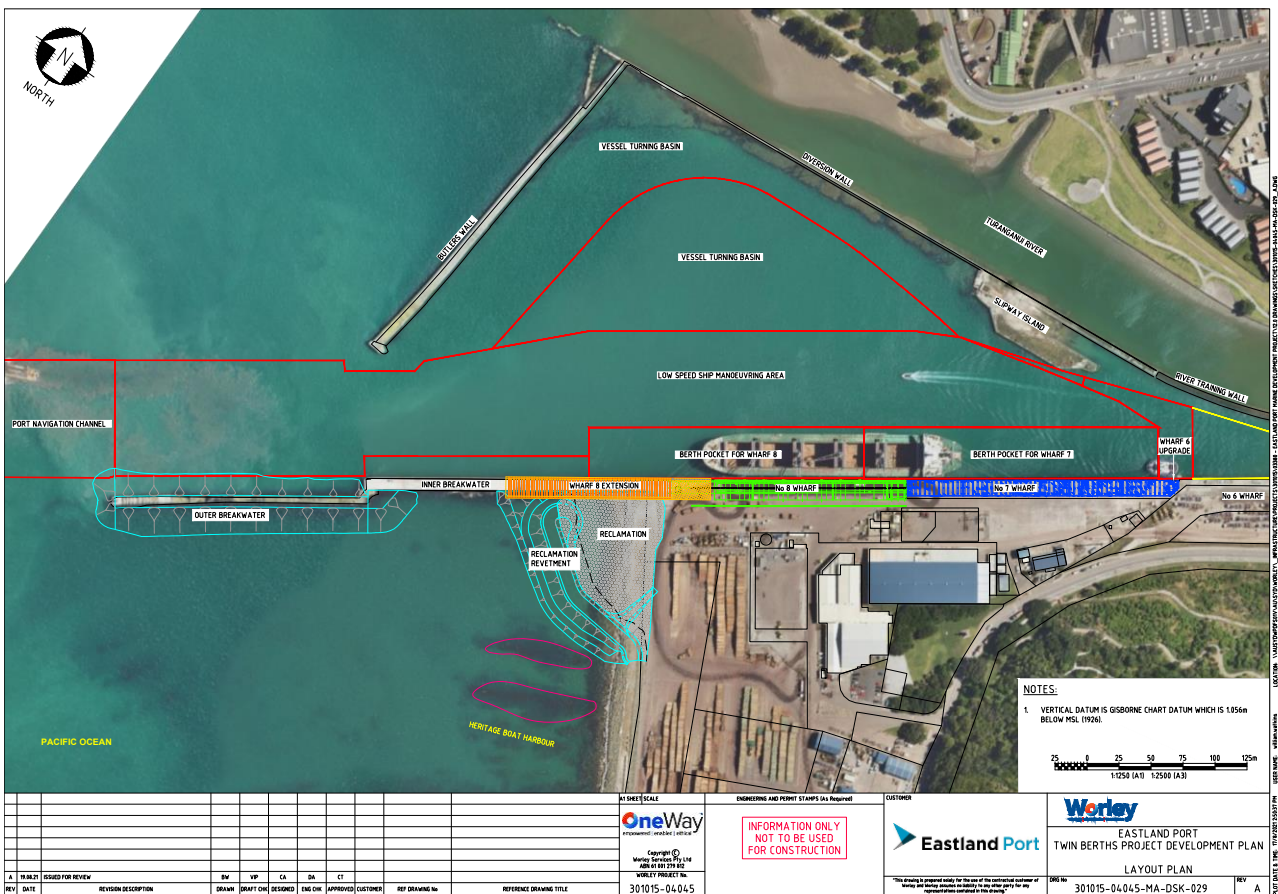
Overall Stage 2 Twin Berth Layout (refer also Appendix 1)
